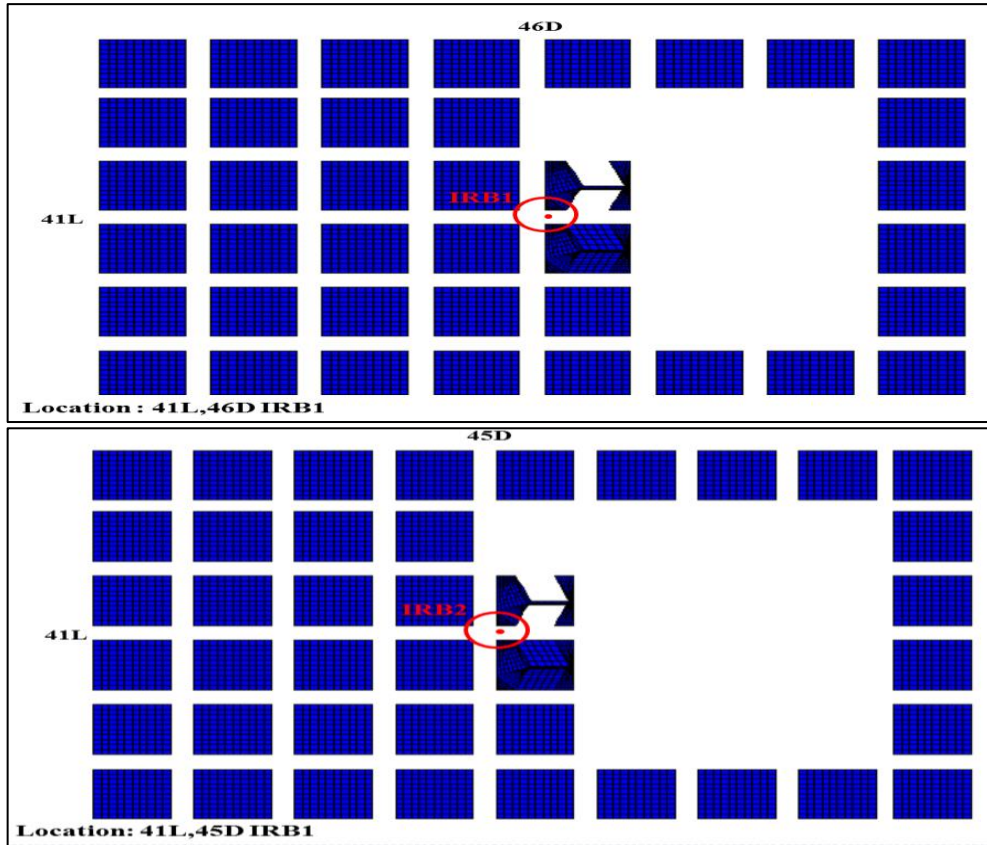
Plan view of bord and pillar panel of Pinoura mine showing instrumented rock bolt location
